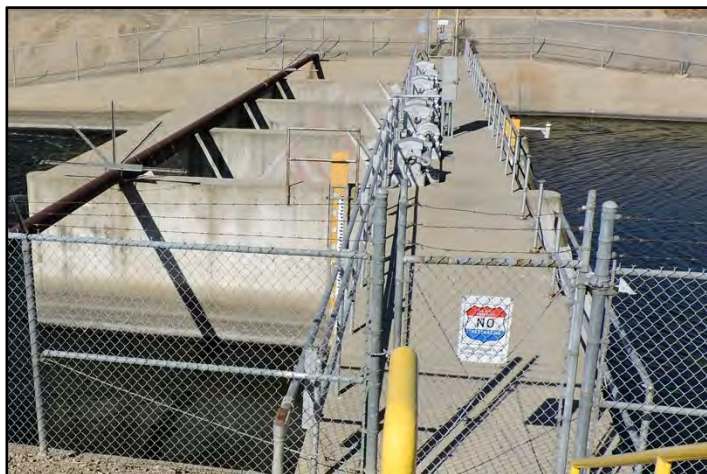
View of Segment 15, showing a well discharge and remnants of a deleted pipe crossing at M.P. 78.31; camera facing downstream from left bank, June 14, 2022 (C0267).
